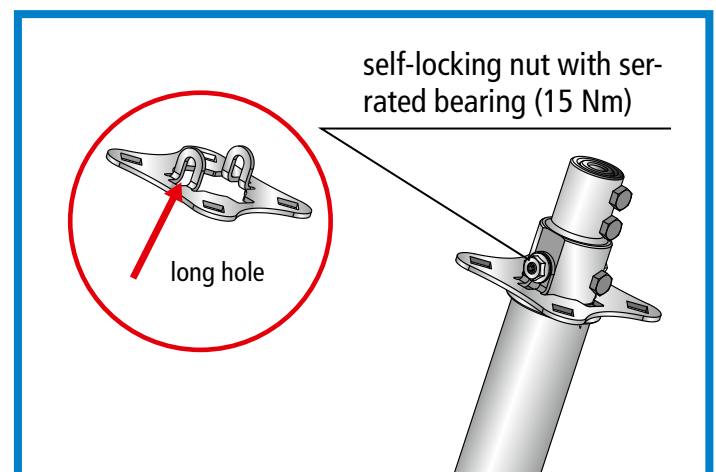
Step 2 for installing a HVI®long Conductor outside the supporting tube
